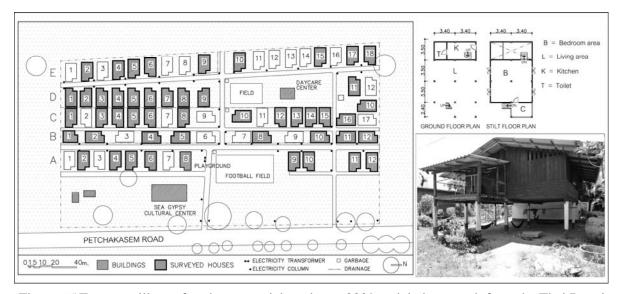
Tungwa village after the tsunami (based on a 2009 aerial photograph from the Thai Royal Survey Department) and a photograph of the rebuilt house (taken by the author)
